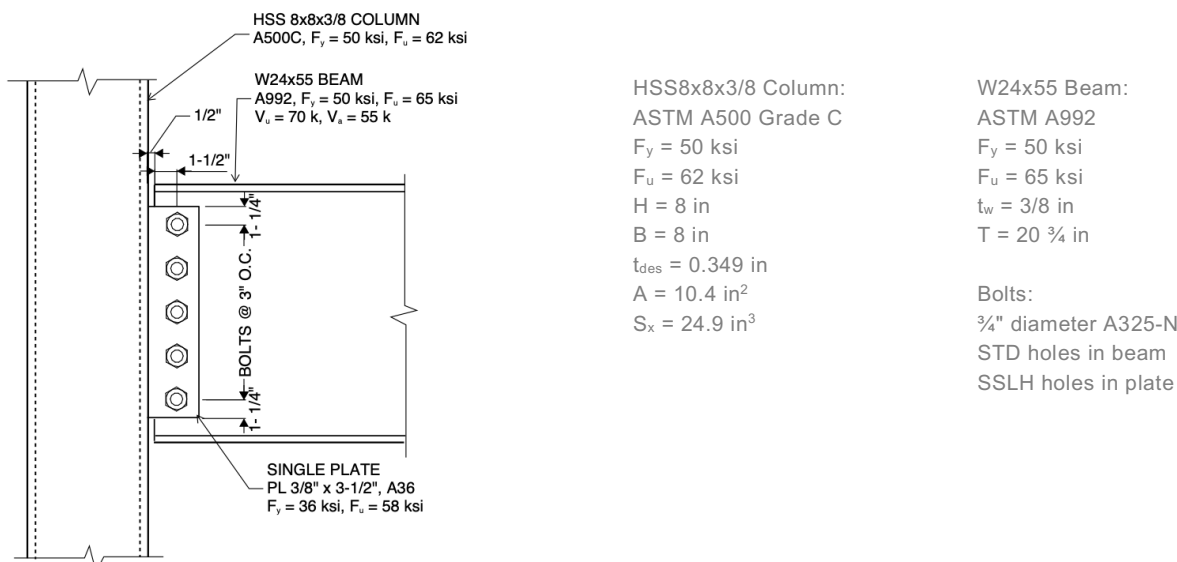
WF Beam-to-HSS Column Single Plate Shear Connection
